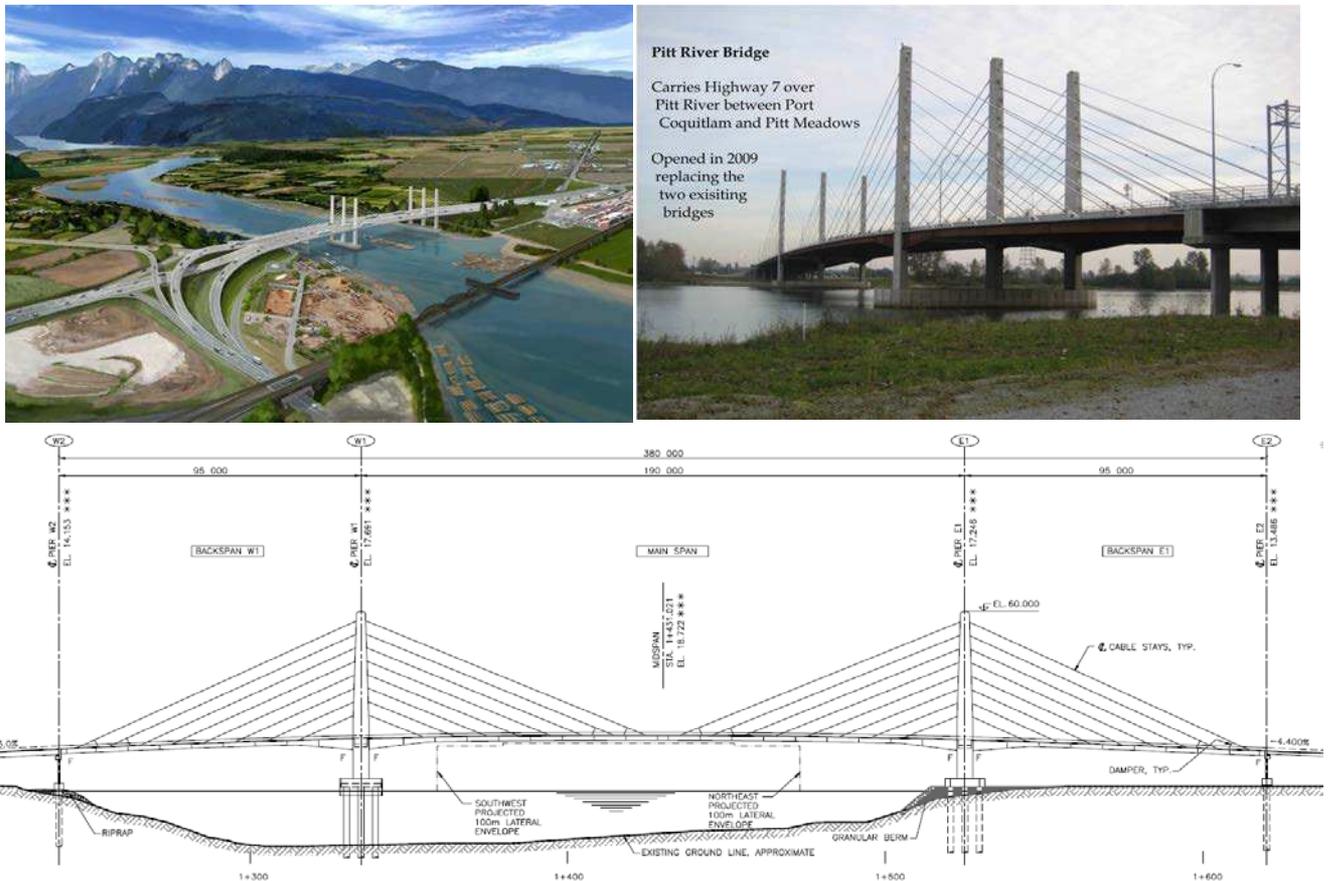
Overview and Schematic elevation of Pitt River Bridge⁴
